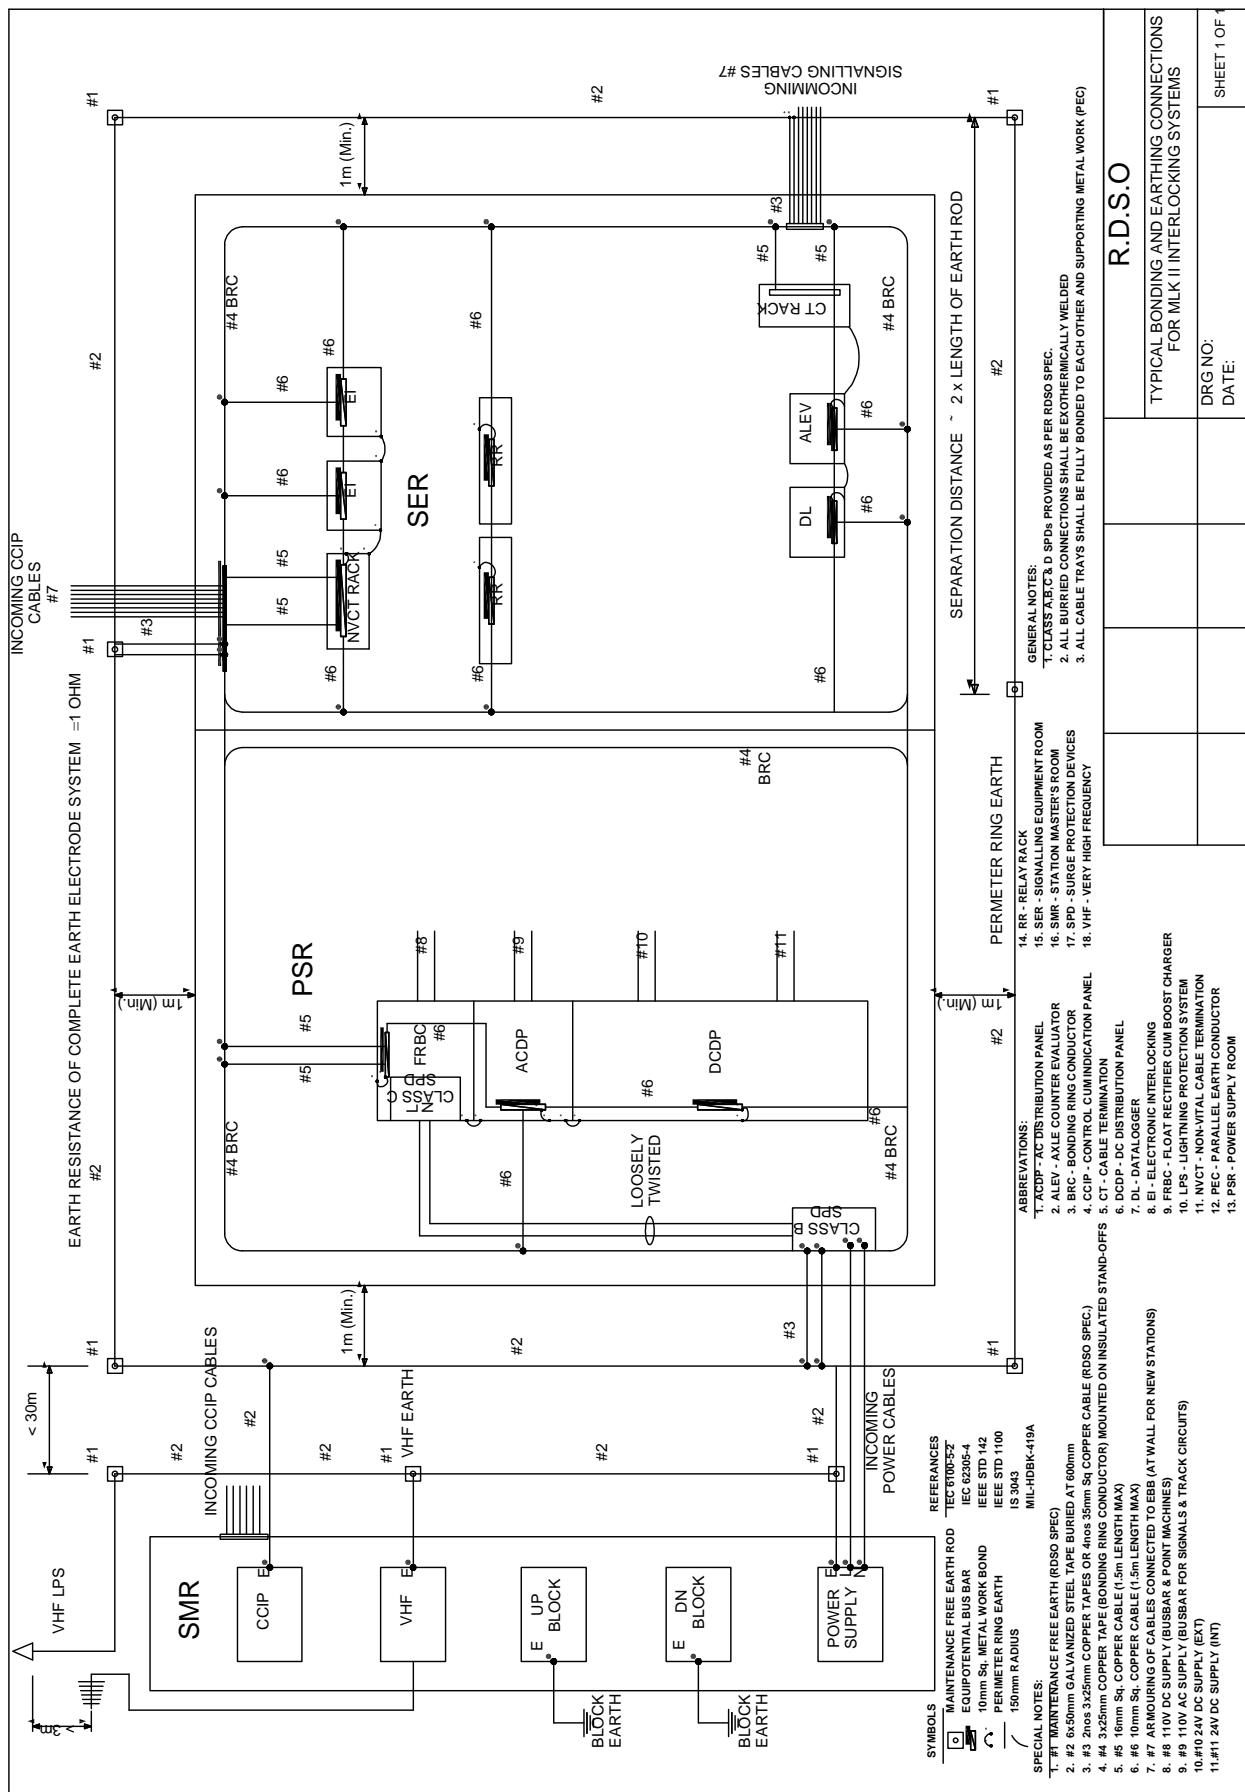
Typical Bonding and Earthing connections for signalling equipments
